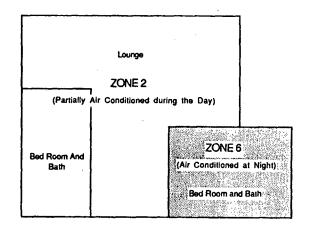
b General Floor Plan of the Prototype Single Familiy House (First Floor)
